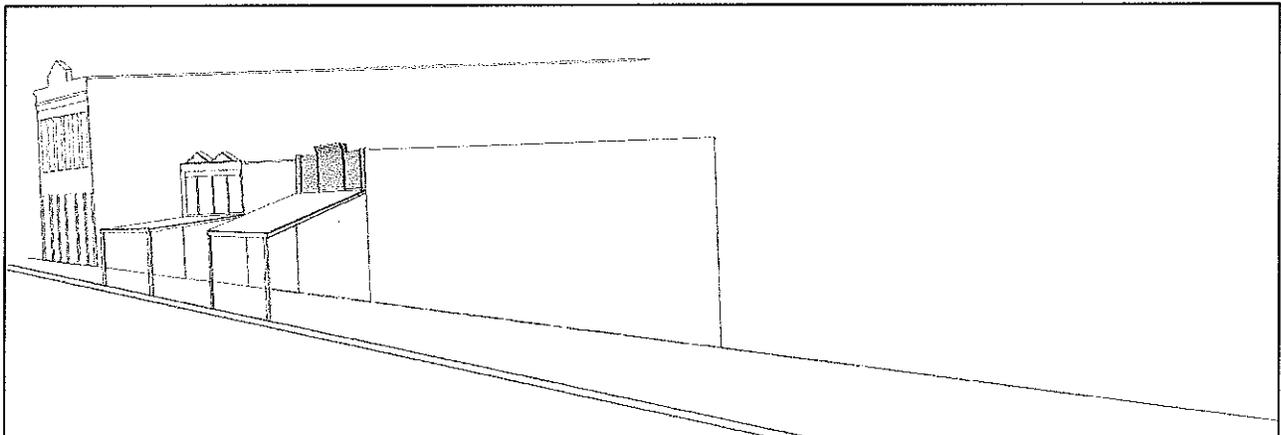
Conceptual drawing showing a restored Chinese Building and reconstructed Chew Kee and Company Store.
